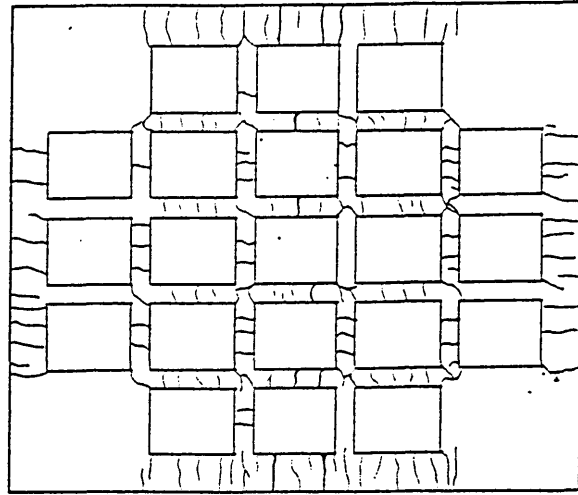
Failure Crack Pattern of R.C.Waffle Model Slab H2
